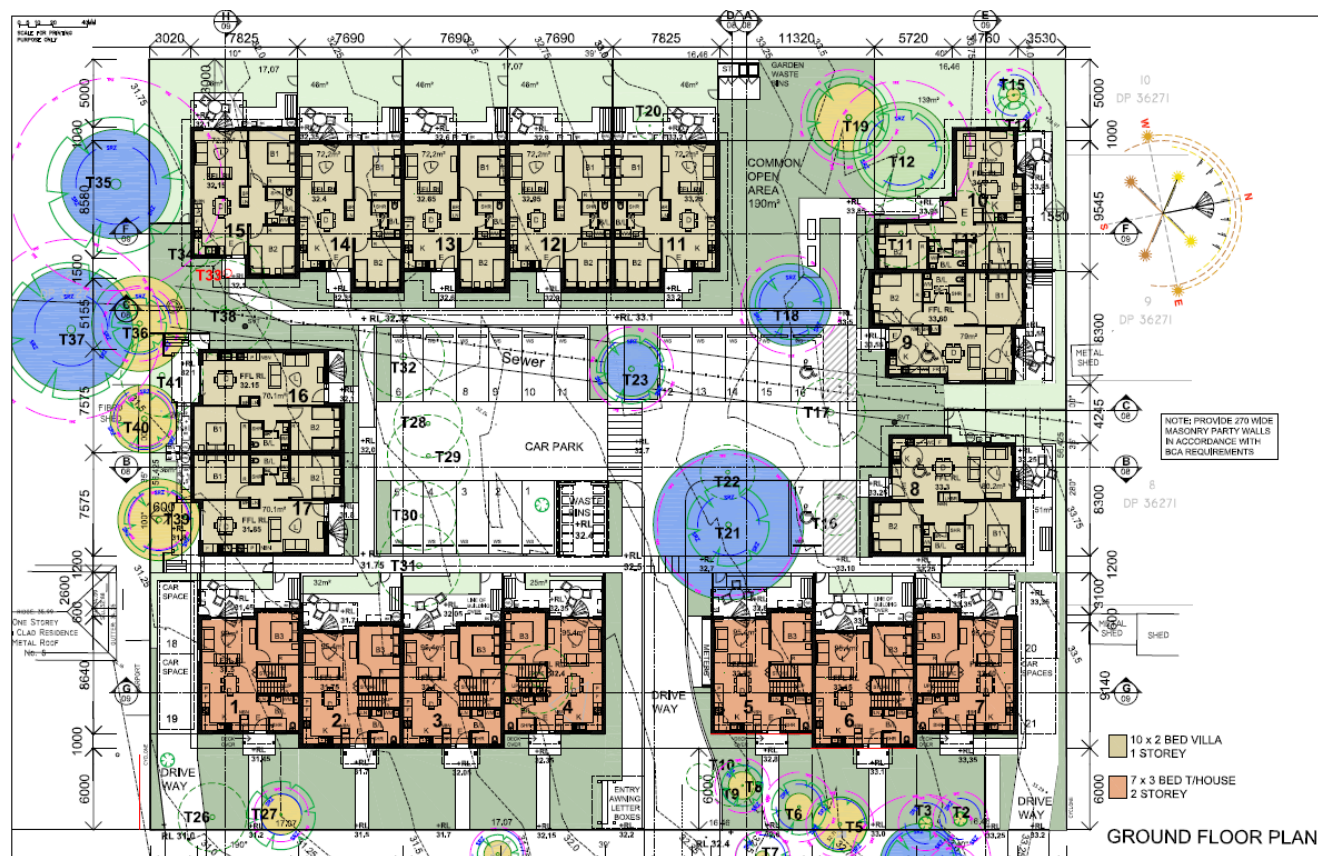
Ground Floor Plan (Source: Architectural Plans, Barry Rush & Associates Pty Ltd, dated 27/04/2023)
